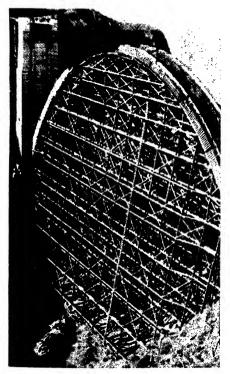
Construction form work for a reinforced-concrete bridge. (Portland Cement Association.)
